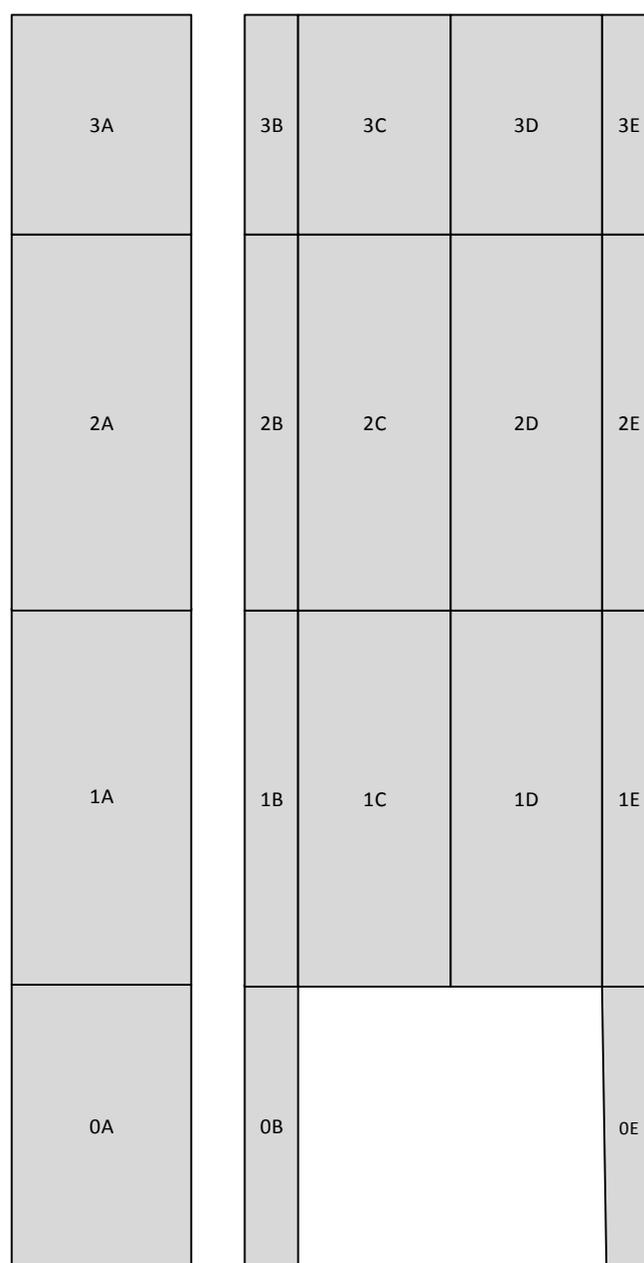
Layout of panels and labelling system used for reporting purposes. Not to scale.
